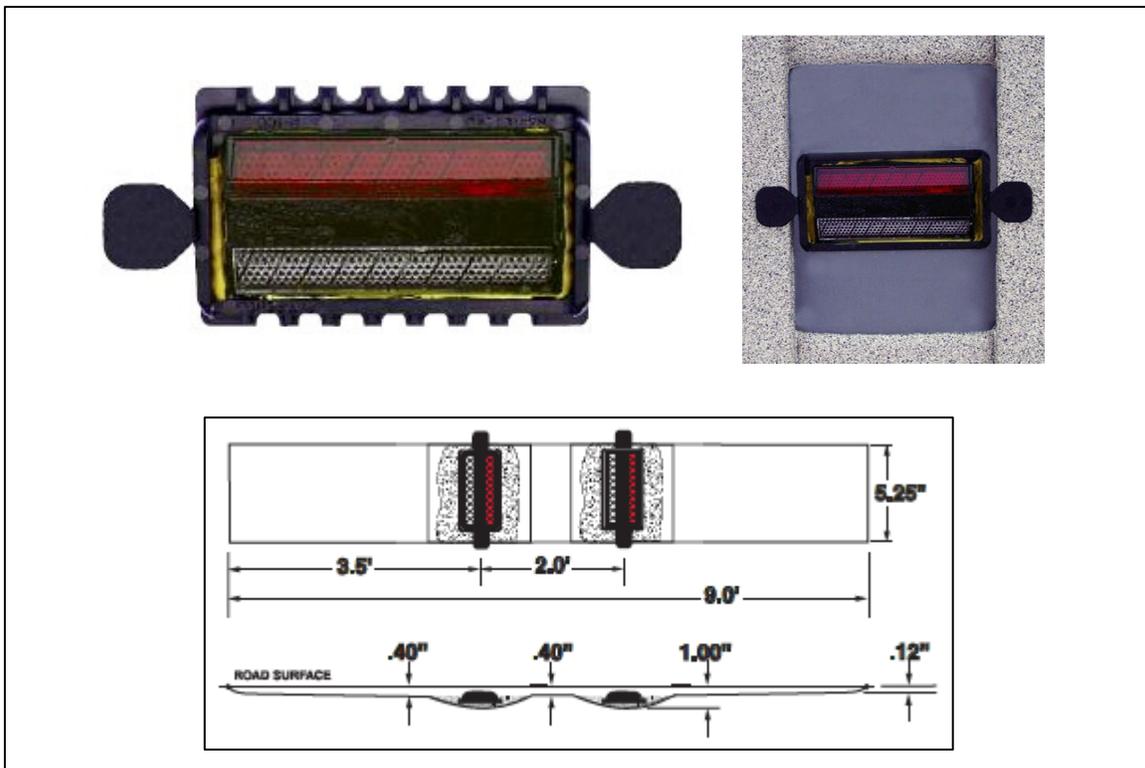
Inlaid Pavement Marker and Groove Dimensions
